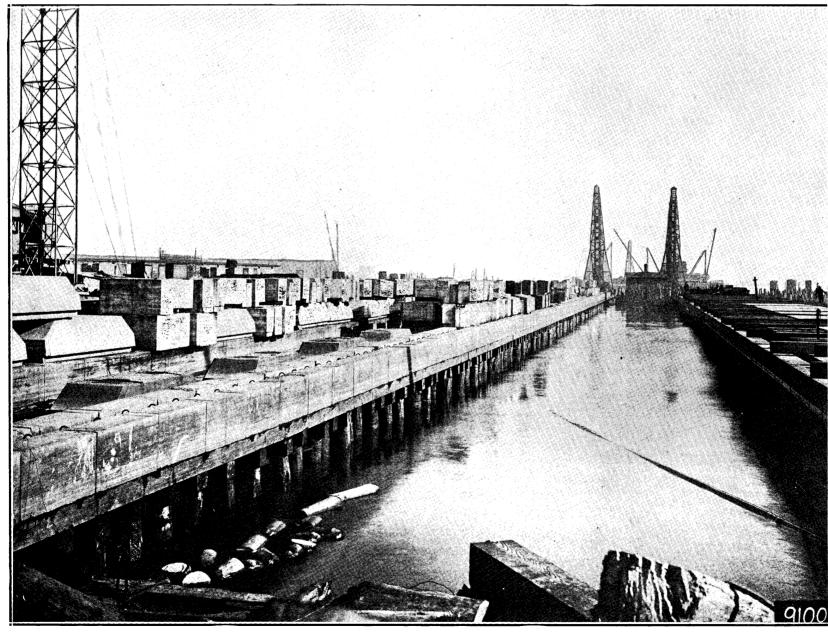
New Erie Railroad Pier, New Jersey. Looking East from Bulkhead.
